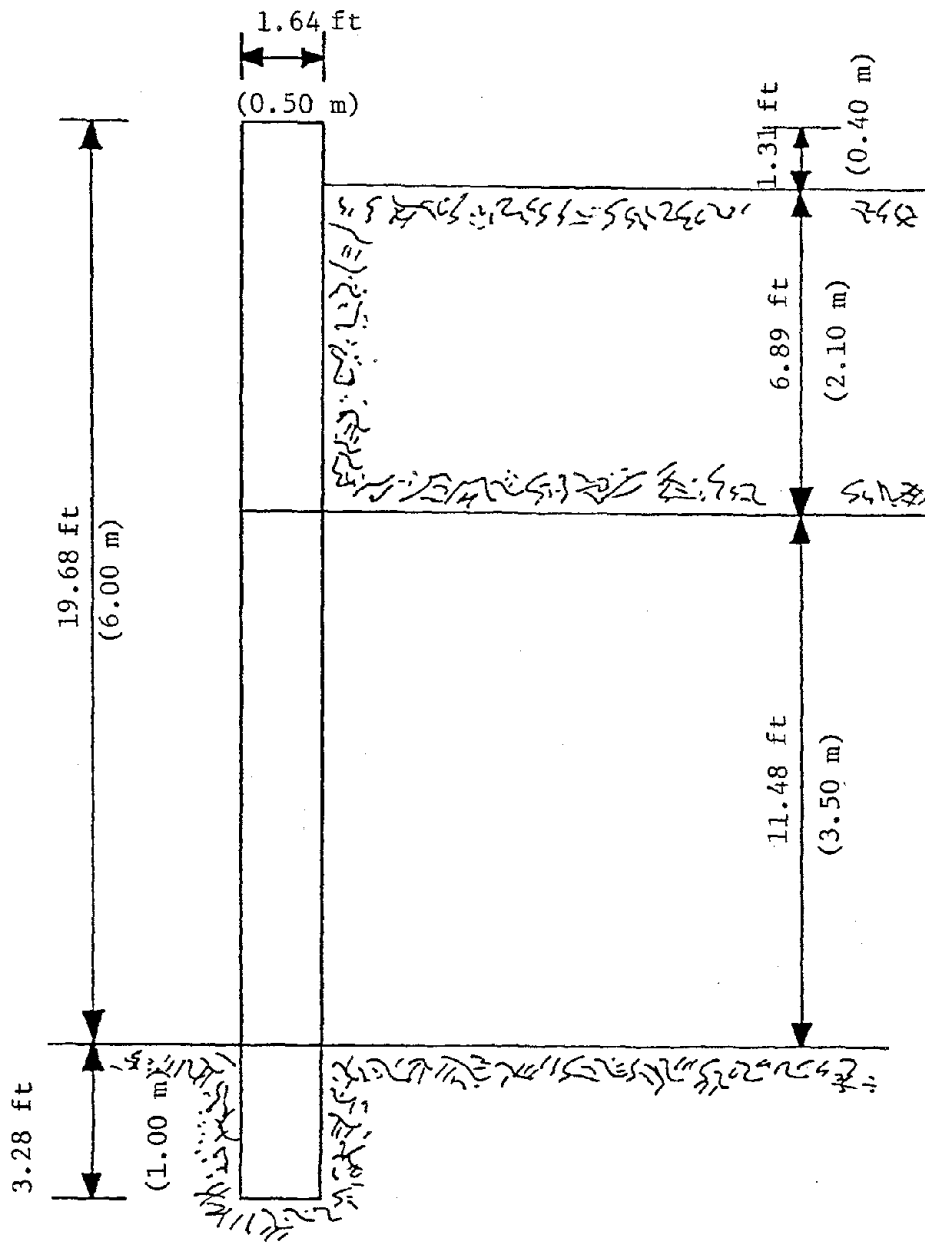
CROSS-SECTION OF TORRENT DRAINING FACILITY
